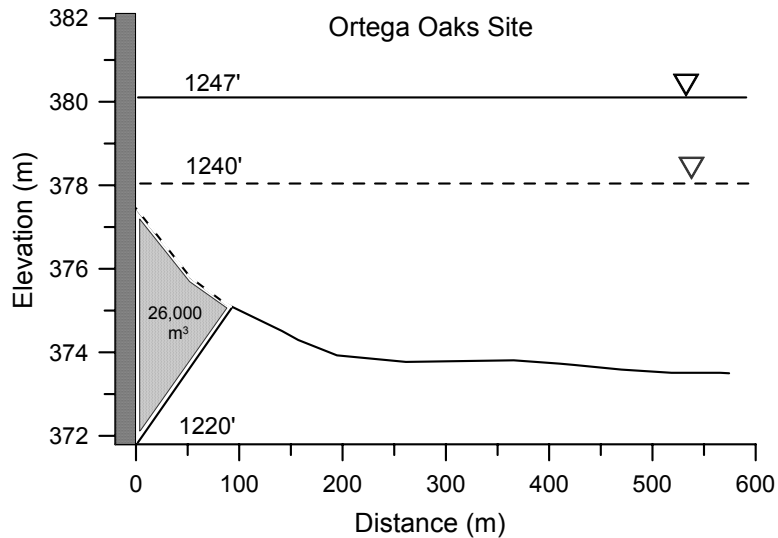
Approximate longitudinal cross-section near intake showing bottom contour and zone of sediment excavation: Ortega Oaks site.
